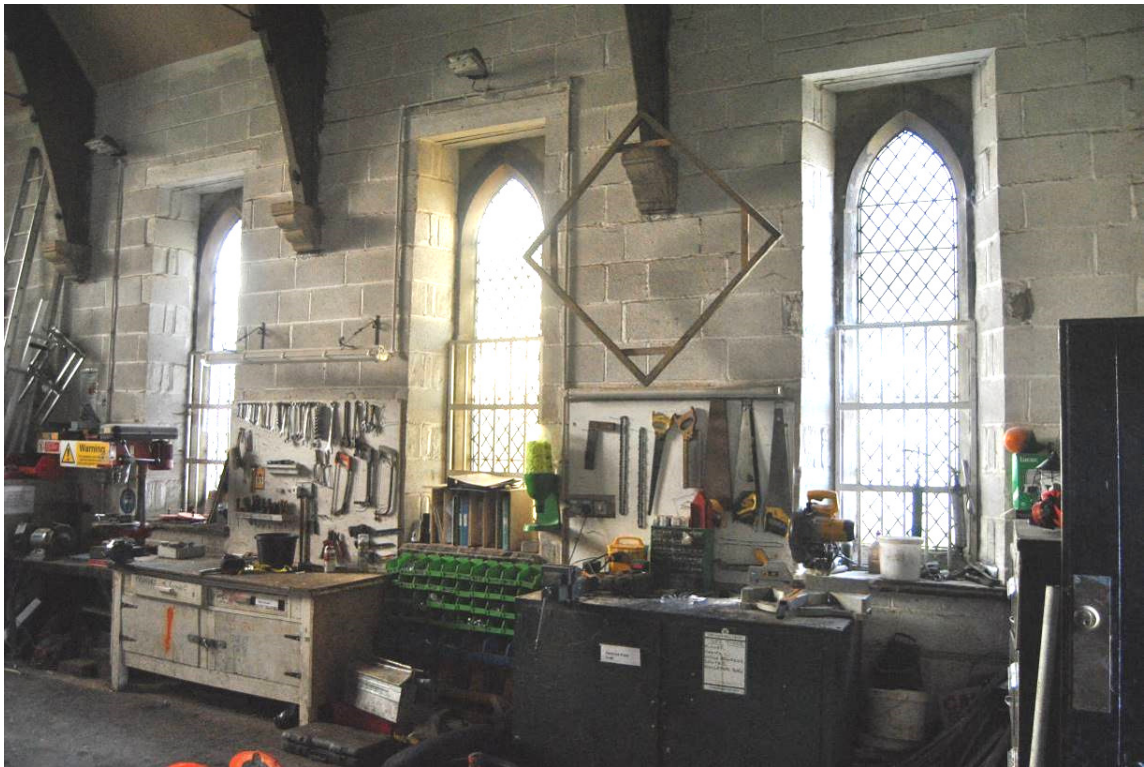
Lancet windows and breeze-block lining of rebuilt west elevation.
